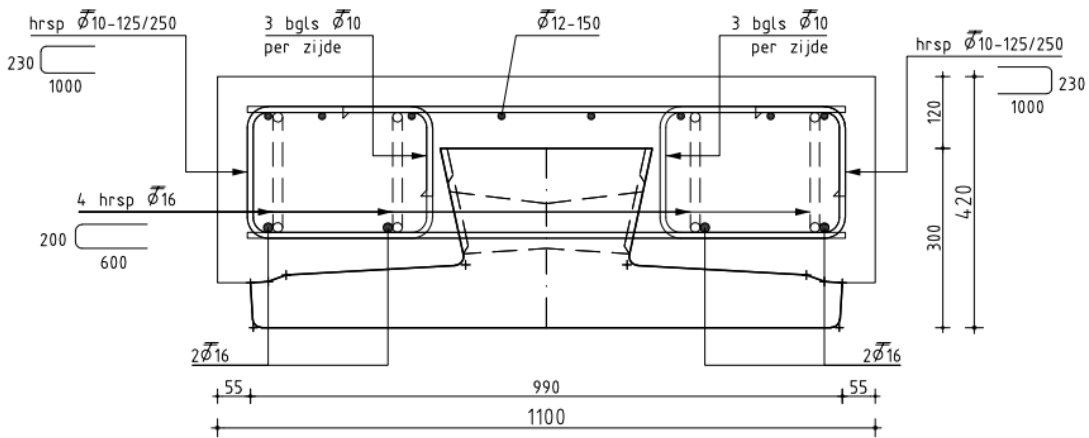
Cross-section of composite section and reinforcement layout of cast in-situ topping
